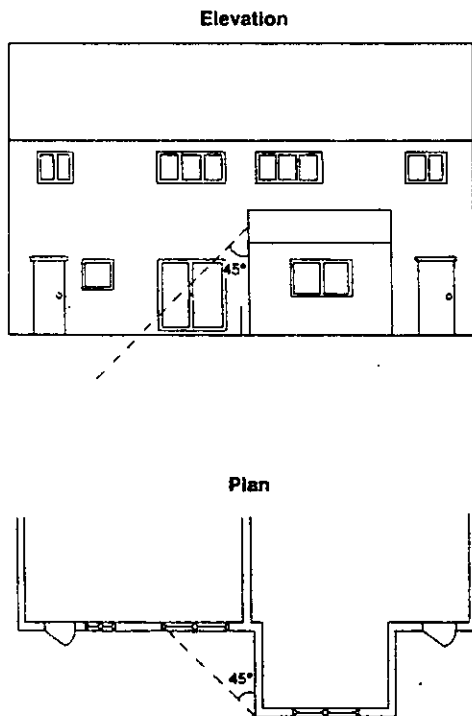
Application of the 45° approach to a domestic extension. A significant amount of light is likely to be blocked if the centre of the window (or, for a floor-to-ceiling window as here, a point 2 m from the ground) lies within the 45° lines on both plan and elevation
